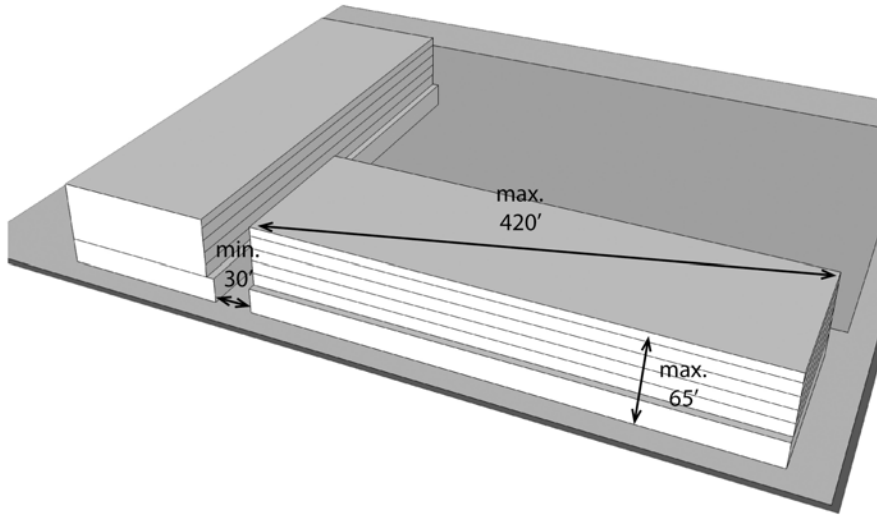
Height, Bulk and Spacing for Buildings 65’ High
